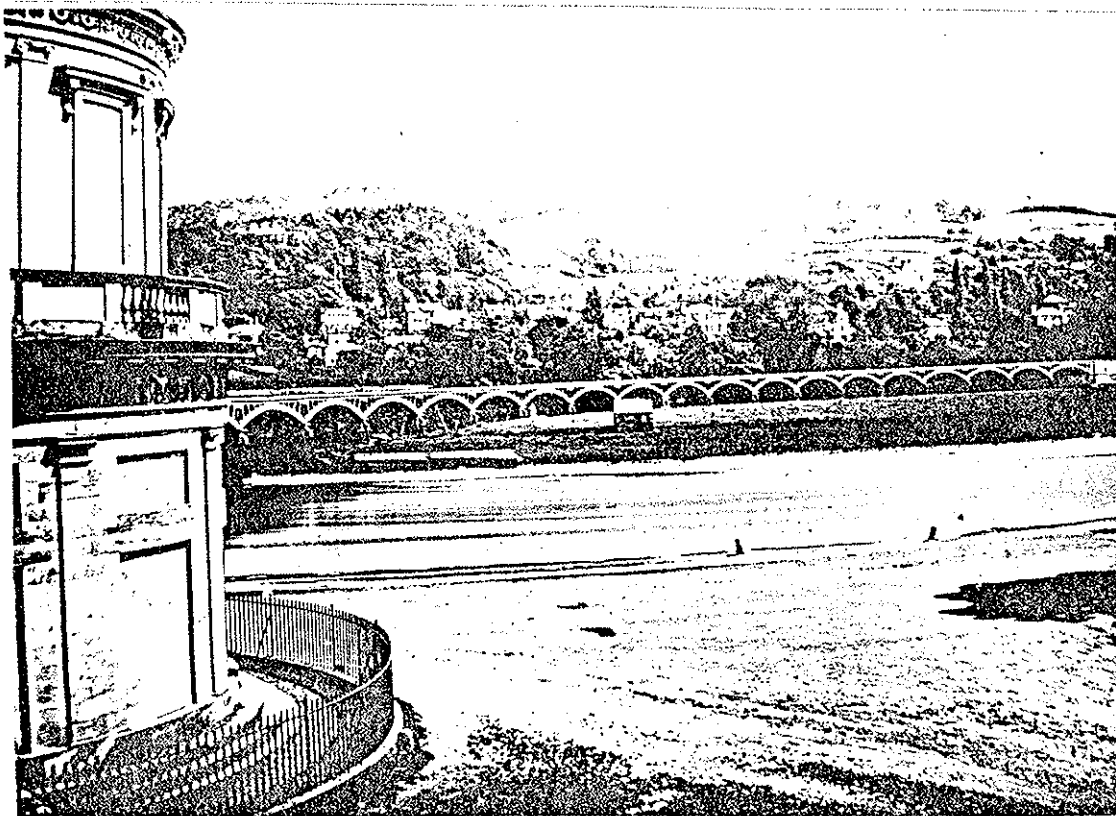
Lamination timber arch bridge on the Dundee and Perth Railway. Built 1849. Replaced 1862.
